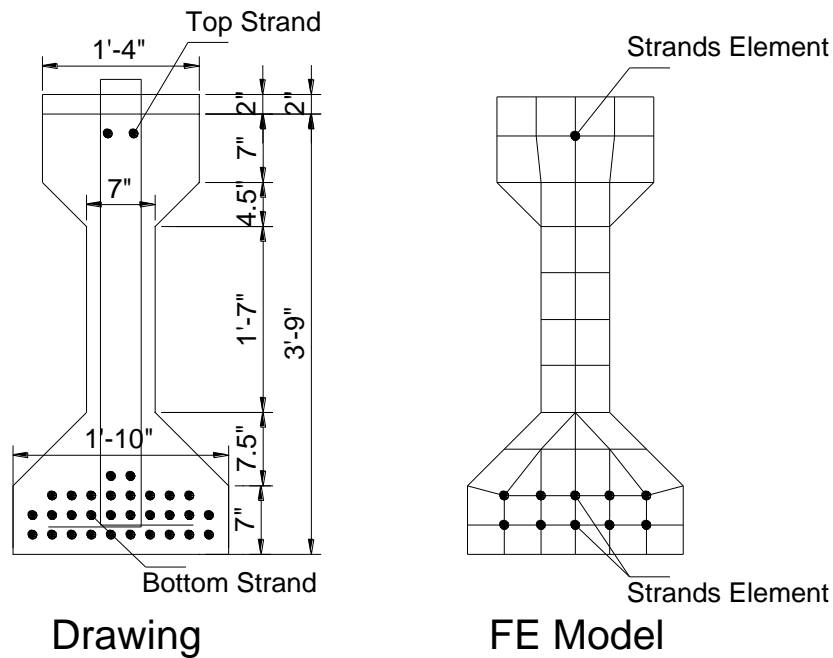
Cross-Sectional View of Archetype 3 Bridge Girder at Mid-Span: (Left) Actual Strands Distribution and (Right) Strand Elements in FE Model.
